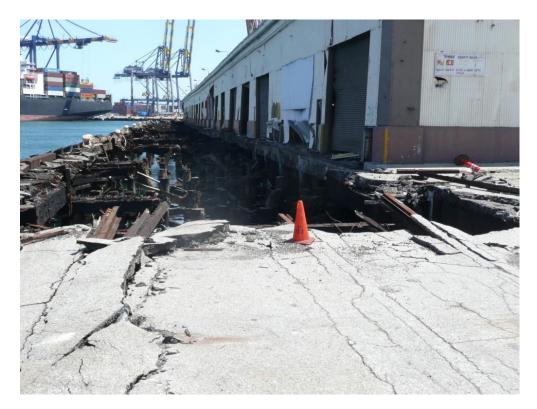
Fire-Damaged East Façade of Building and Wood Wharf
